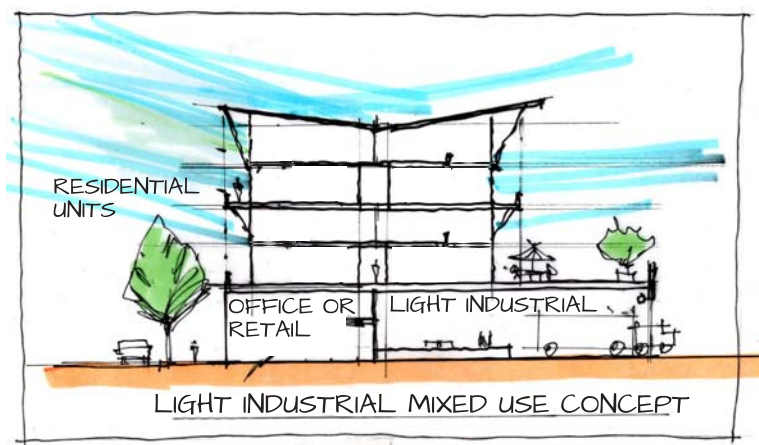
Example of a light industrial and residential mixed use building, showing how residential units might be set back from the loading areas.
